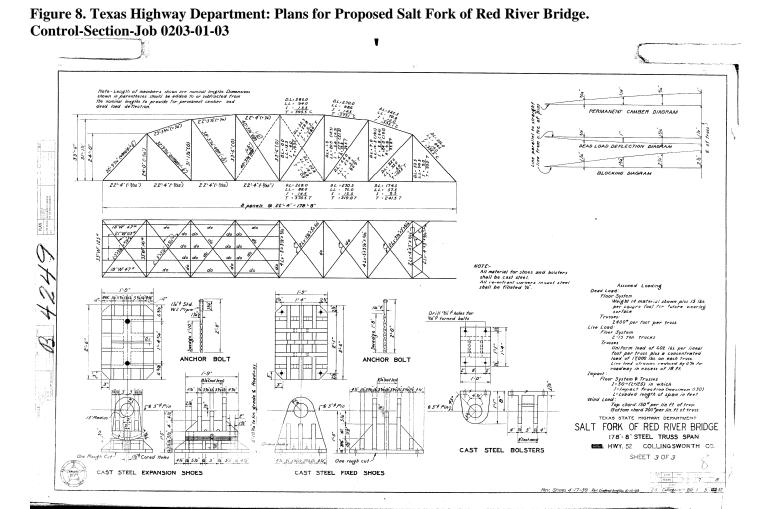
Texas Highway Department: Plans for Proposed Salt Fork of Red River Bridge. Control-Section-Job 0203-01-03
